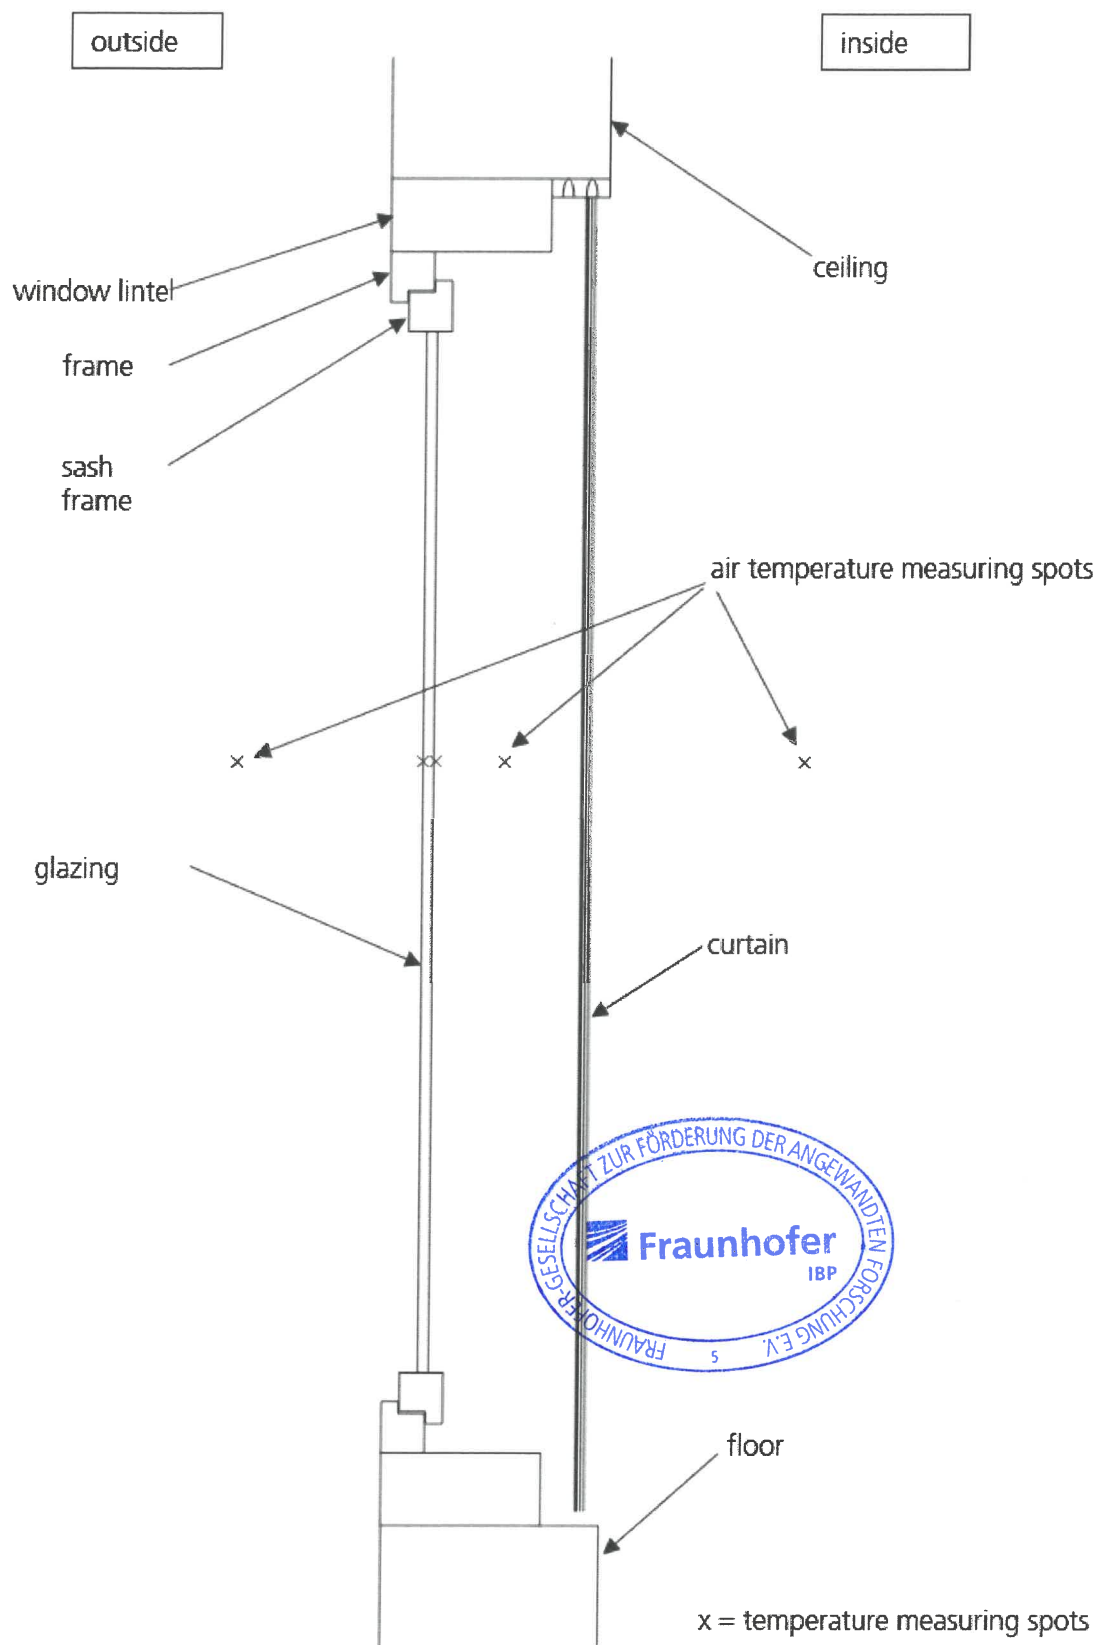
Sectional drawing of the window in [1]. Distance from glazing to rail system of the curtain is 219 mm, and distance to floor is 20 mm.
